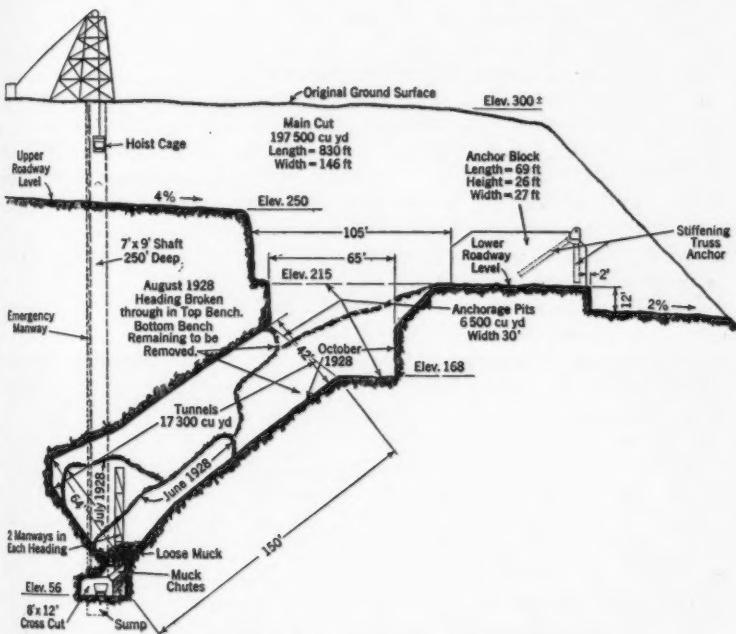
DIAGRAM OF ANCHORAGE TUNNEL EXCAVATION.
